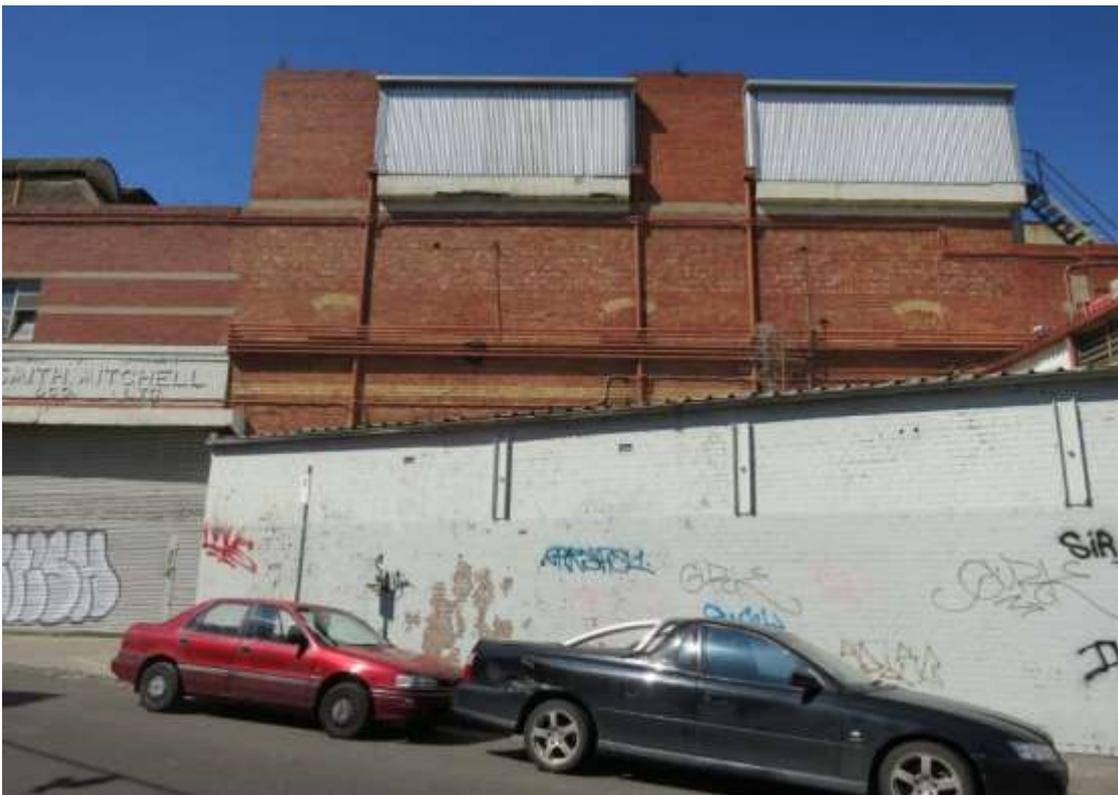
B5, north elevation to Gough Street; powder coated aluminium louvred screens will replace the corrugated steel panels to the north roof elevation; the painted wall to the 1918/19 north addition, in the foreground, will be retained but modified with new openings, and the paint removed
